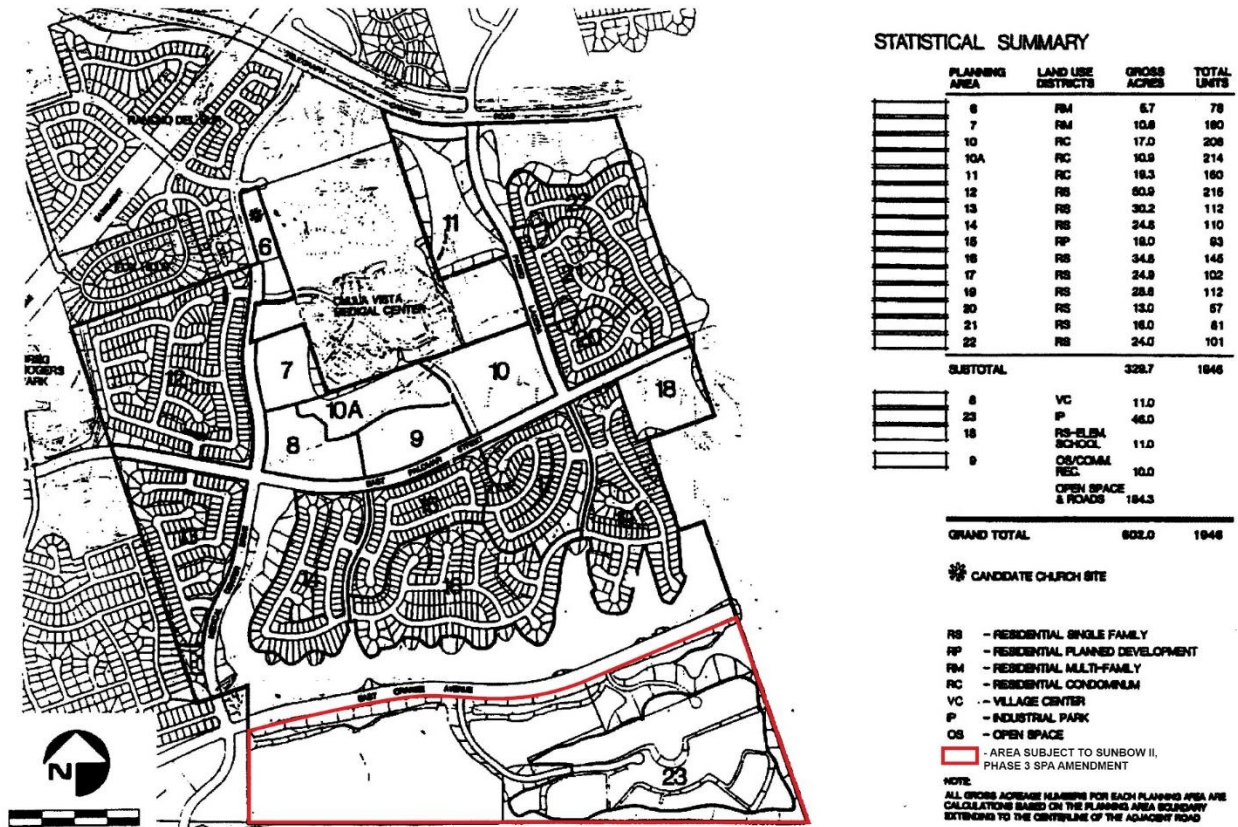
SPA Plan Site Utilization Plan (Sunbow II SPA Plan 1990)
